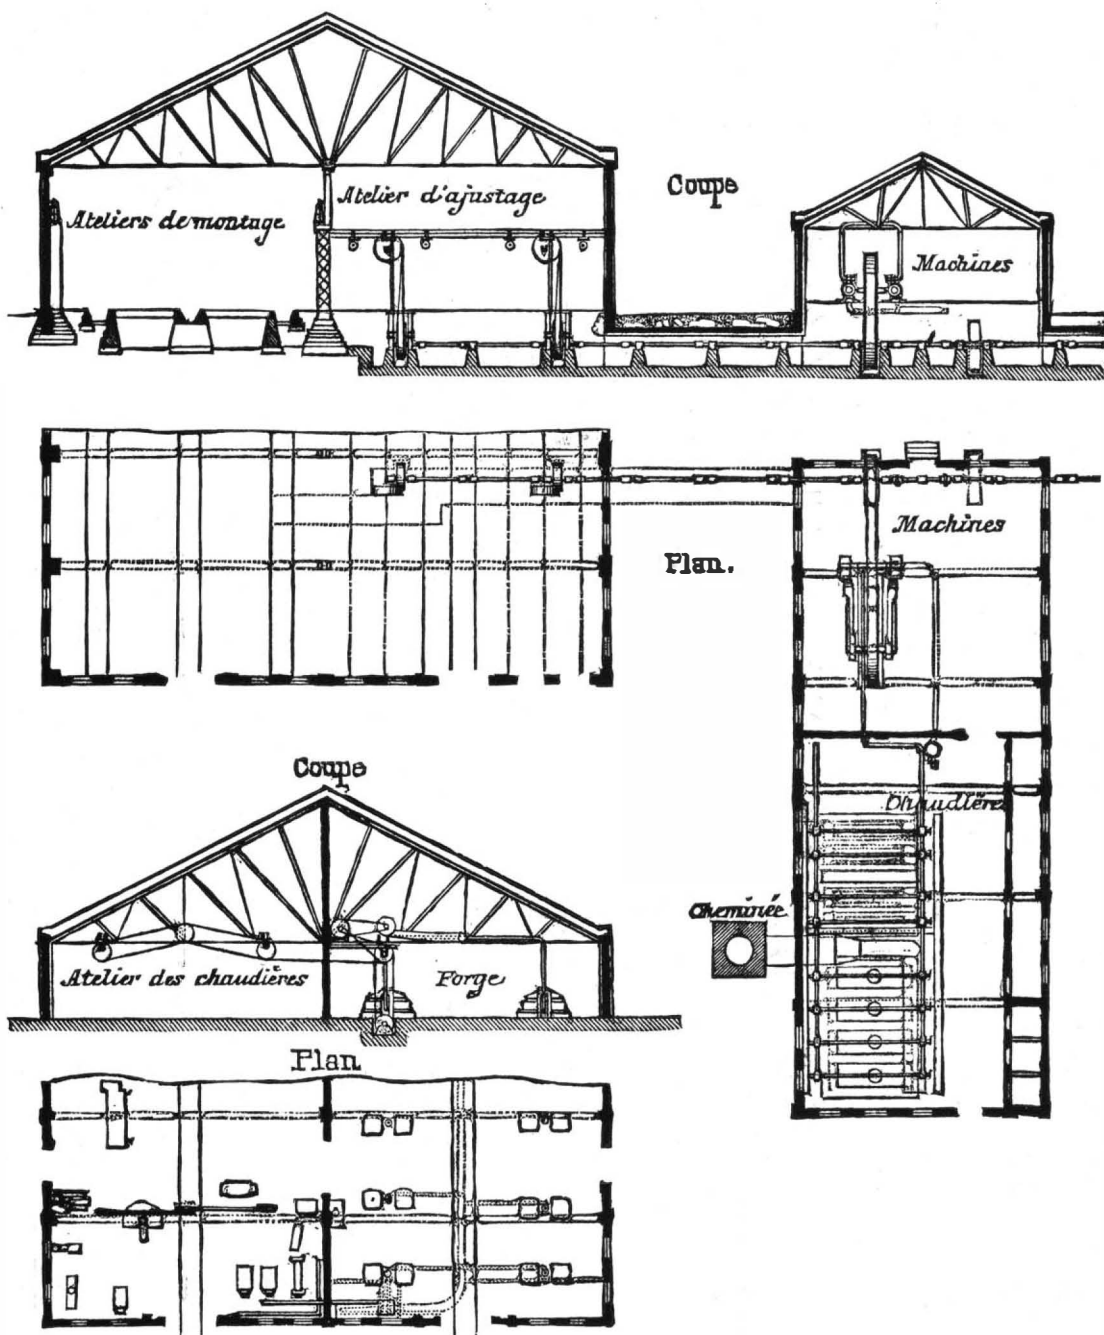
DETAILS OF WORKSHOPS AT BURLINGTON, CANADA.
